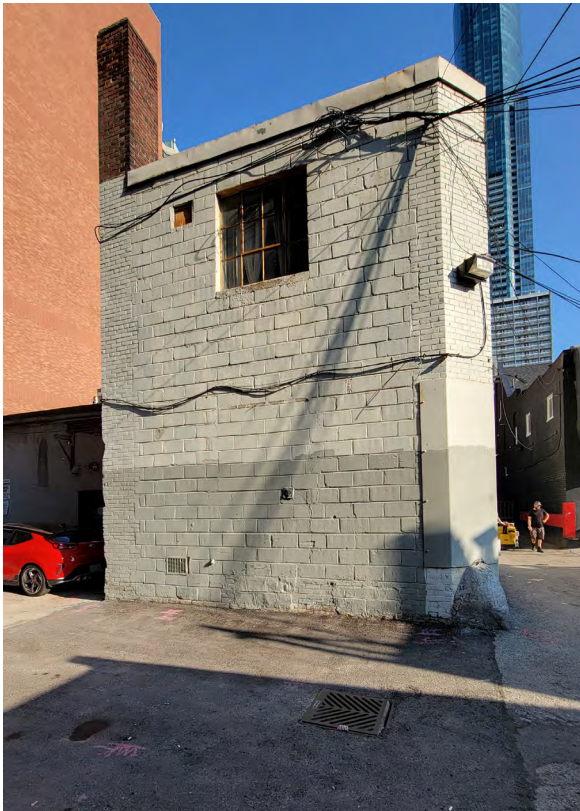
Rear masonry wall at grade is defective (ERA, 2022).
